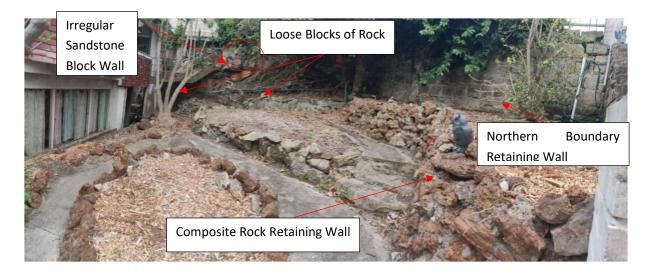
Northern Side of House, No. 33 (2 Photographs)
